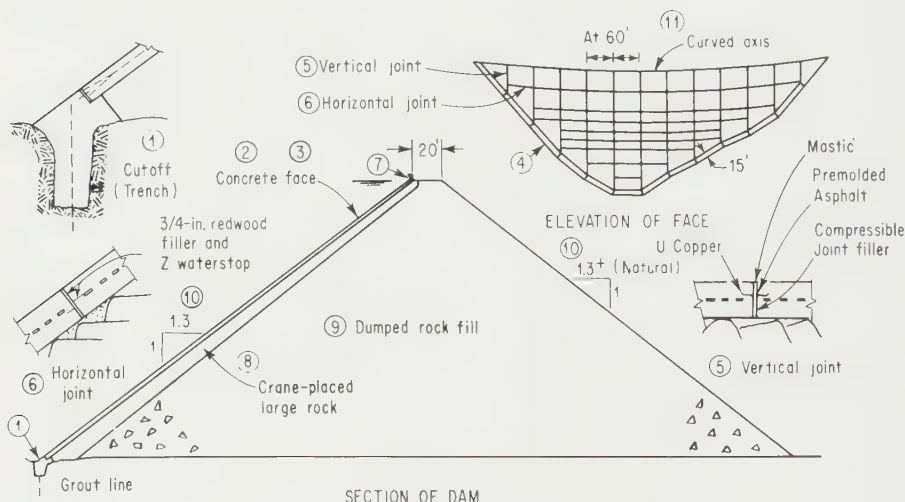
Typical traditional design of concrete-face rock-fill dam.
